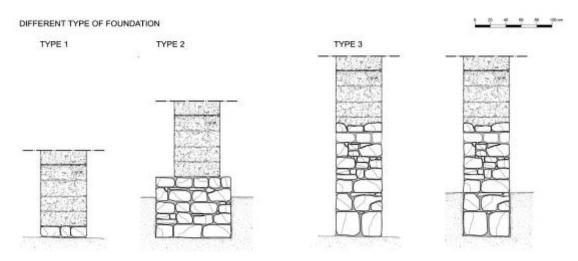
Types of foundation. (credits: Baglioni E., 2009)
